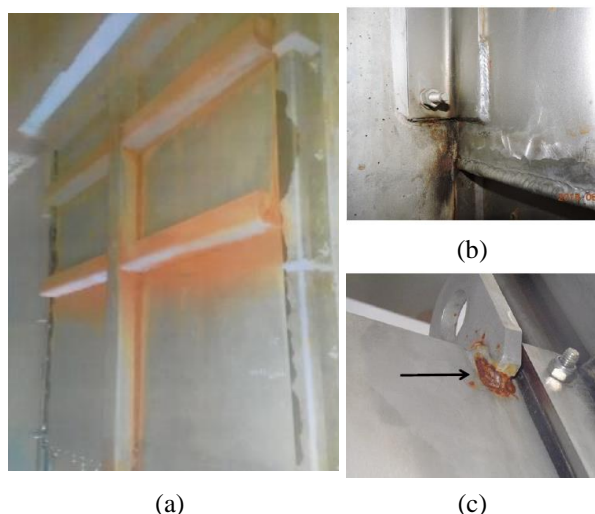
Indication of corrosion at welds in slide gates of the water treatment plant: (a) General corrosion in the slide gates stiffeners, (b) Corrosion at fillet welds and (c) Corrosion at fillet weld in lifting lugs.
